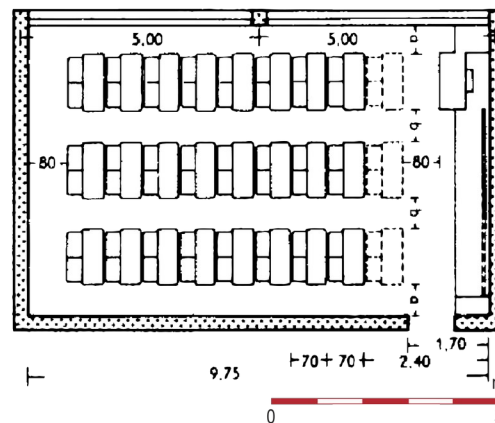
Plan shows tradicional classroom lay out(NEUFERT, 1976, adapted)
